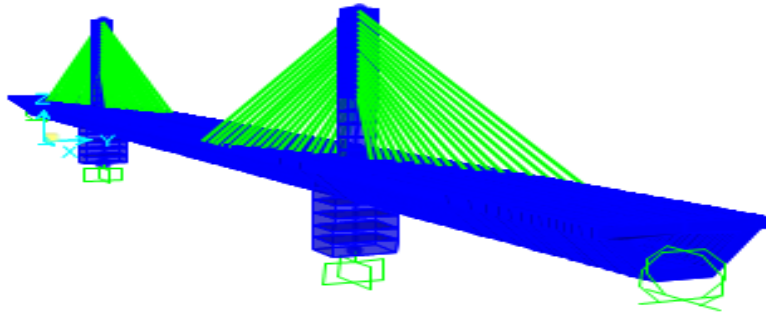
Model of Cable-Stayed Bridge in 3D
